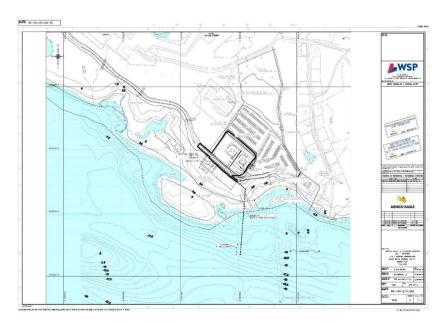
Site Layout - Itivia Storage Facility (Drawing 65-100-210-200)
